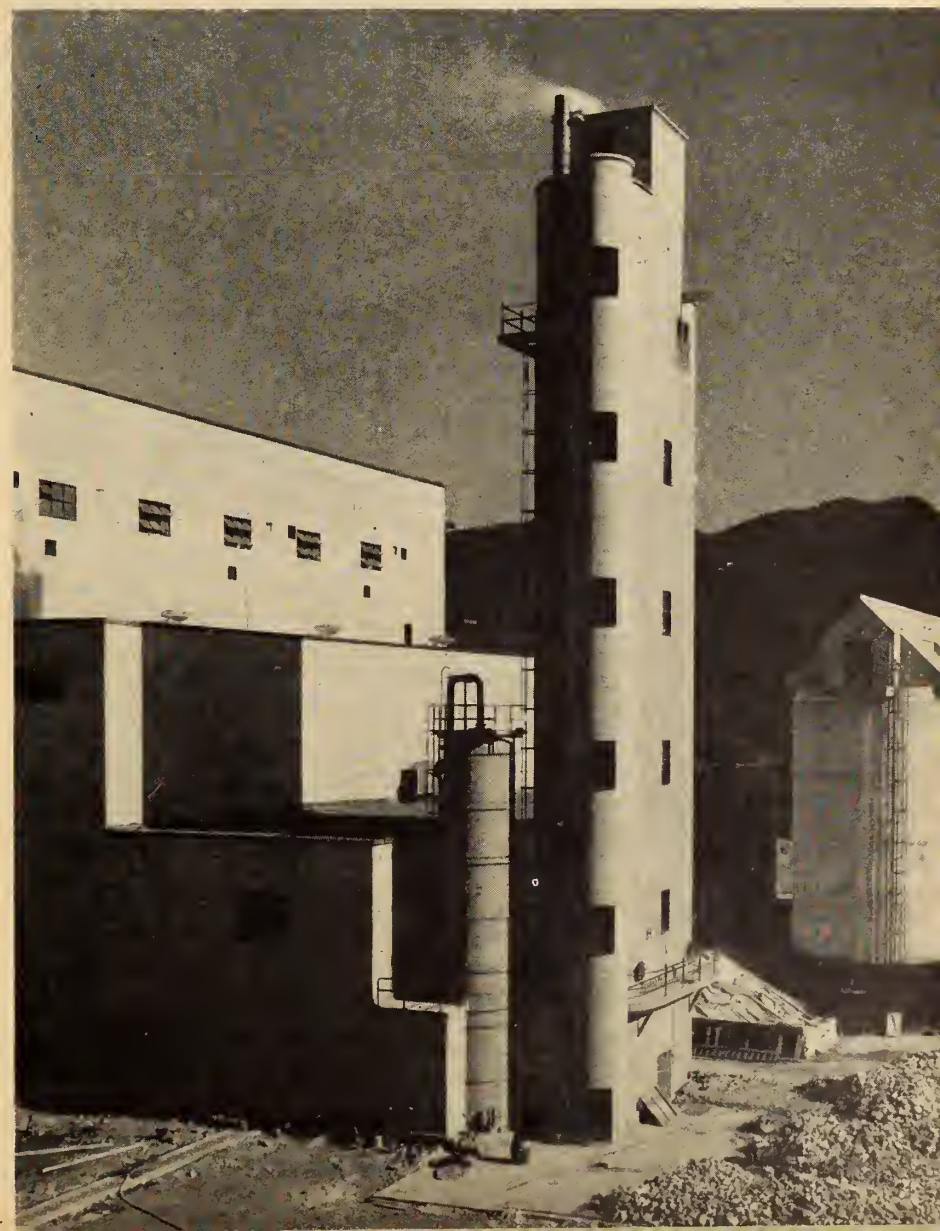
Acid plant with limestone towers. Sulphur storage silos are in the background.
